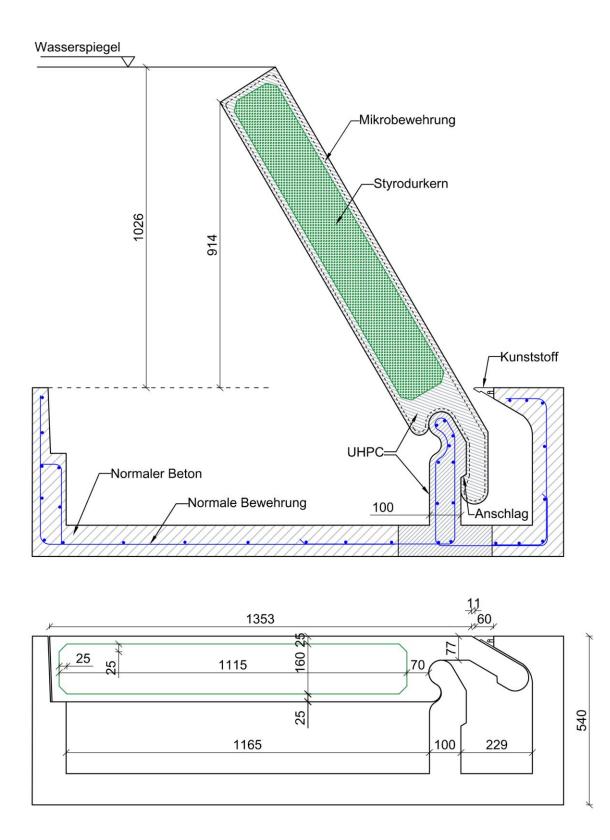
Dimensions, the reinforcement and marking of UHPC and normal concrete
